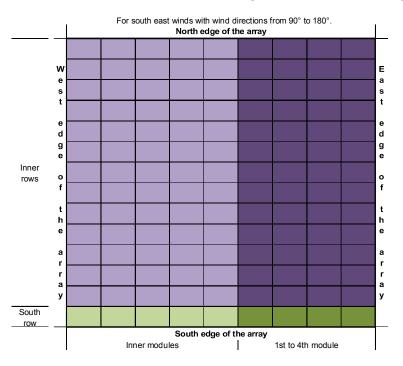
Definition of array zones for the solar ballasted roof mount system "FastRack 510" with a minimum offset "*a*" from the roof edges equal to or greater than 1.0 m and for south east winds from 90° to 180°; valid for flat-roofed buildings with a maximum roof angle of 7°
